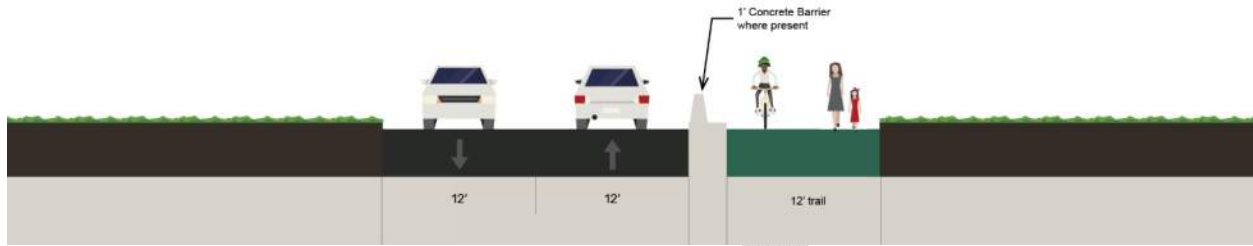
Beach Street (Eastbound) East of San Andreas Road to West of Lee Road
